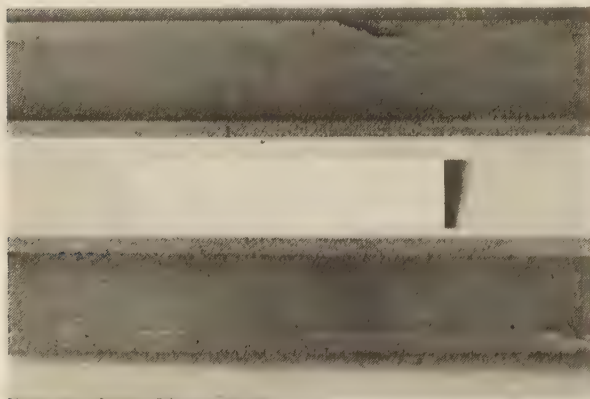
CLOSE-UP VIEW OF SOUTH TUBE AS SHOWN IN FIG. 20
